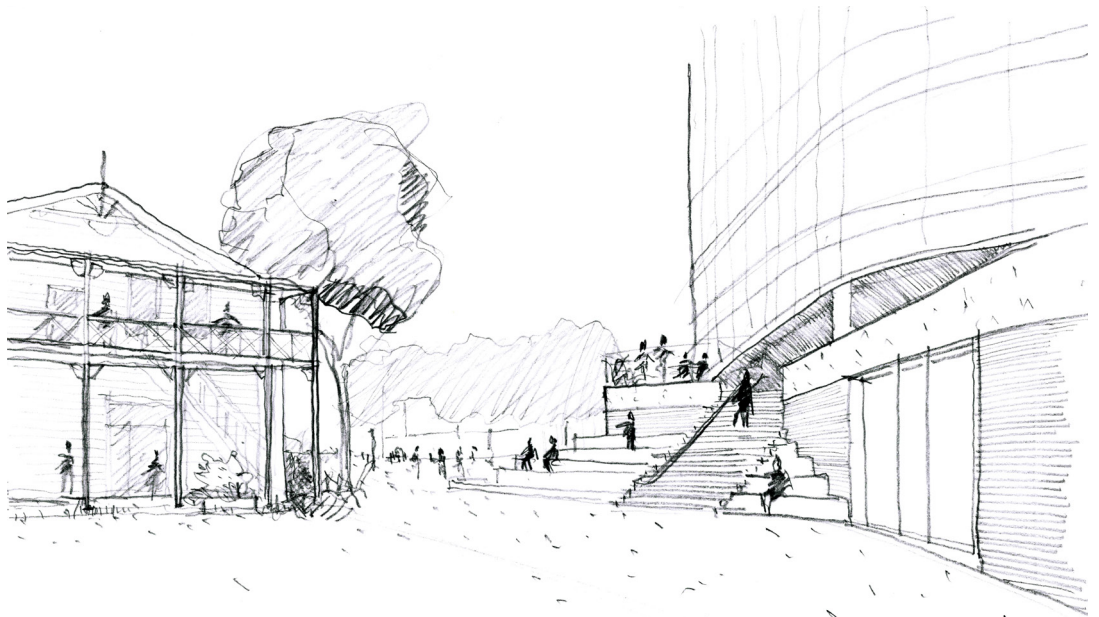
Proposed perspective view looking from the west towards the White House & proposed D14 Academic Building
